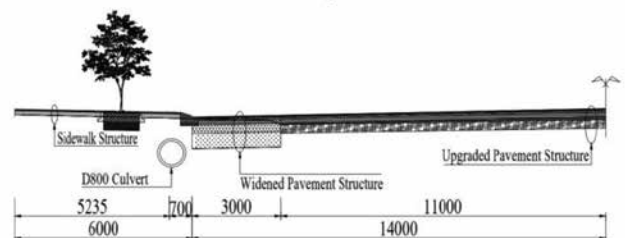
Half of the cross-section of the upgraded pavement (unit: mm)
